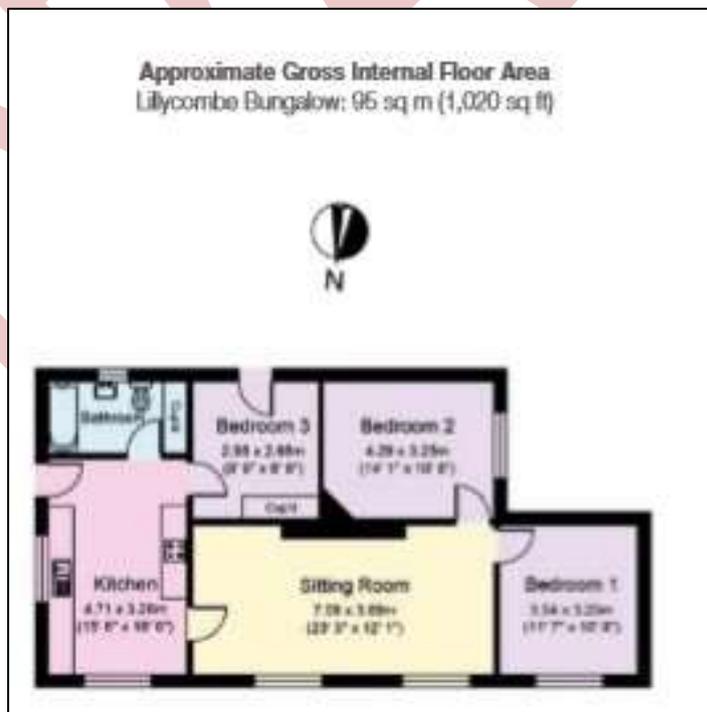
BUNGALOW PLAN FROM THE KNIGHT FRANK SALES DETAILS.
